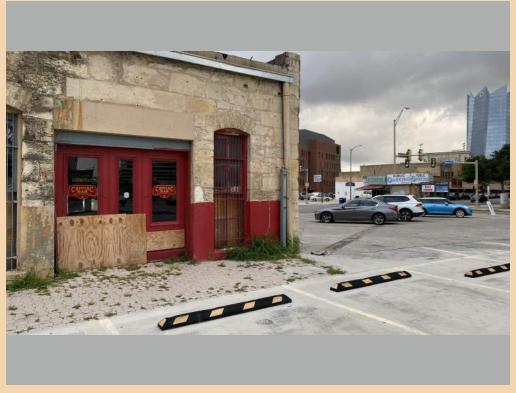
Building at 210-214 S Flores, North & East Elevations. Camera Fcaing Southwest. 12/2021
